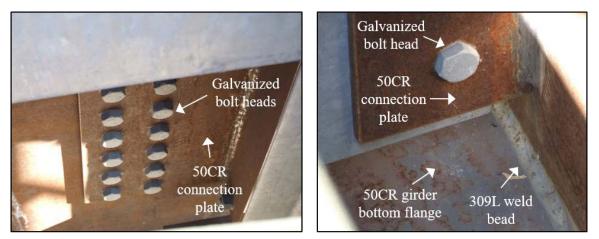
ASTM A709 Grade 50CR Steel Plate With Galvanized Bolts and Weld Bead: left, details; right, close-up of galvanized bolt and weld bead
